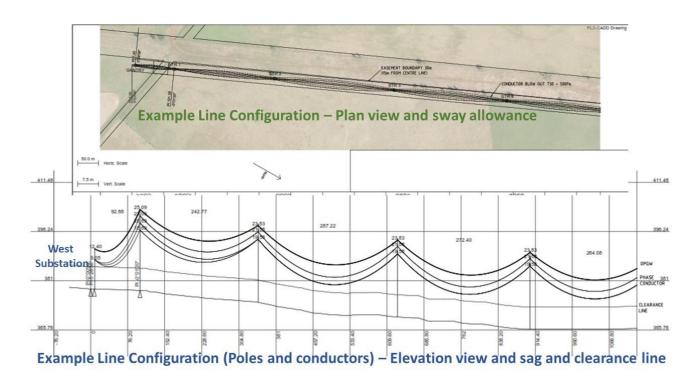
Example Plan and Elevation Views of Line and Clearance considerations
